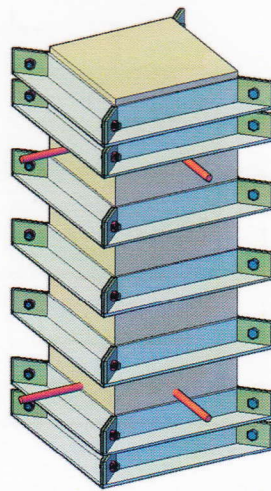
Typical Perspective View of Test Specimen (Specimen S03 as an Illustration)
